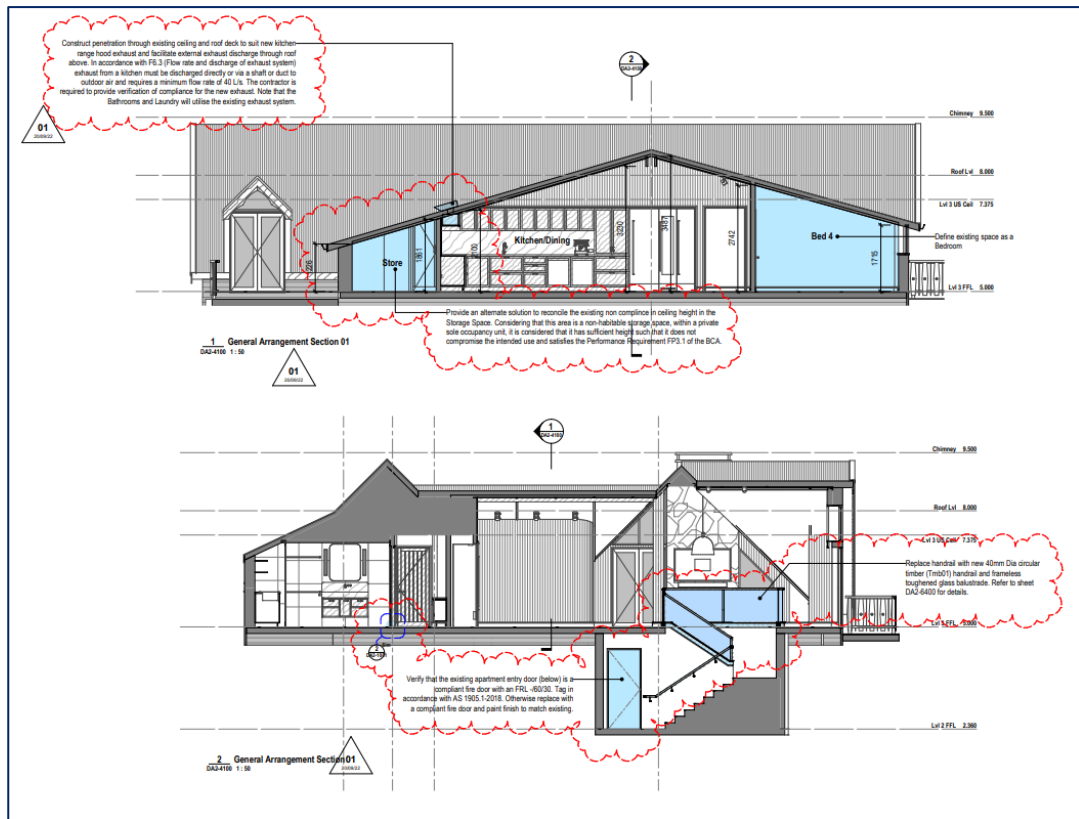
| Cross Section Apartment 5 (Source: Applicant's documentation)
